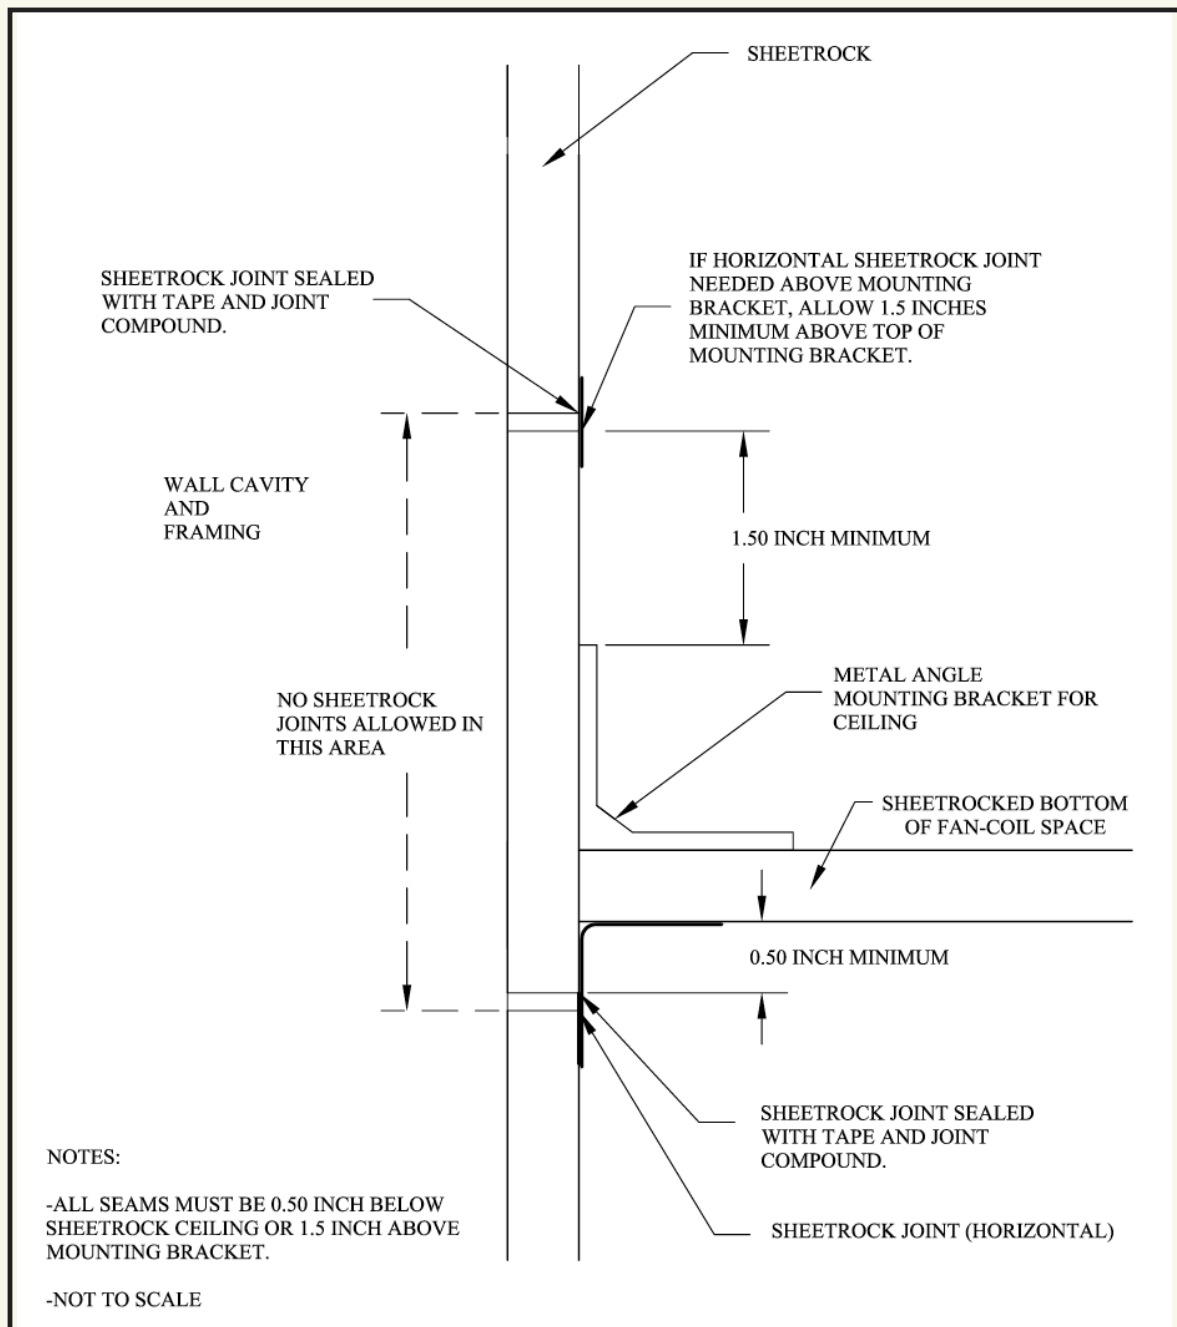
Cross section drywall details for fire code separation for multi-family, non-ducted ceiling returns for fan coil units – Metal Bracket
